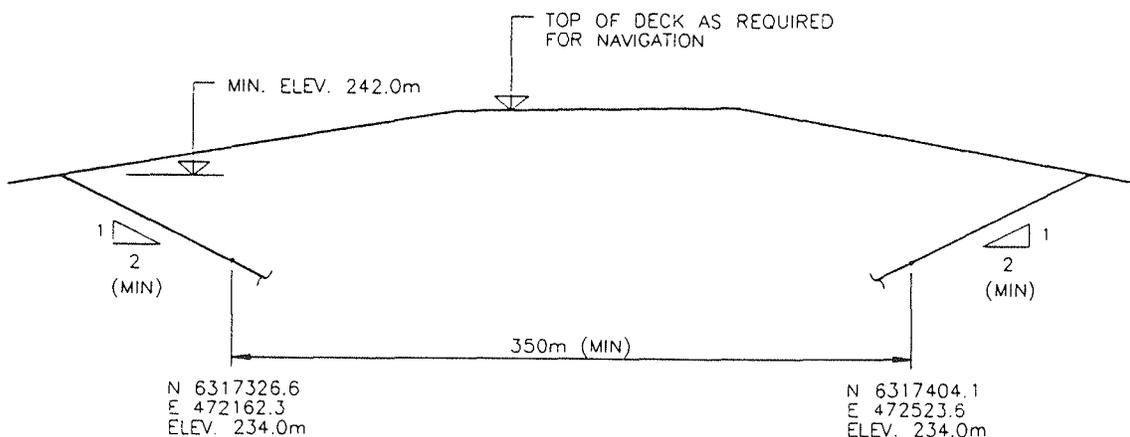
MINIMUM HYDRAULIC OPENING
